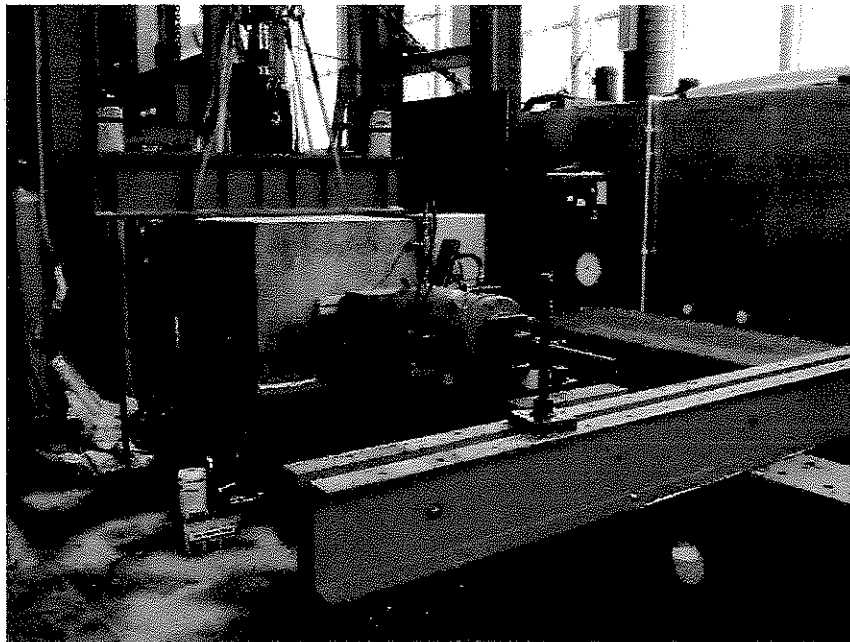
Photograph of Test Setup for No. 14 and No. 20 Bars
